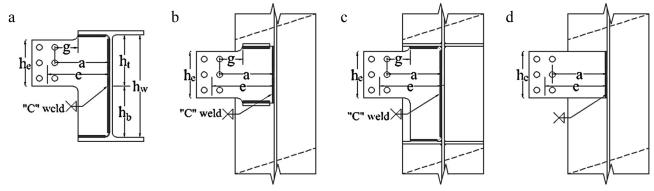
Single-sided extended shear tab configurations: (a) stiffened beam-to-girder with full-depth shear plate (h<sub>w</sub> definition based on CSA-S16 [5]), (b) stiffened beam-to-column, (c) stiffened beam-to-column with continuity plates, (d) unstiffened beam-to-column
